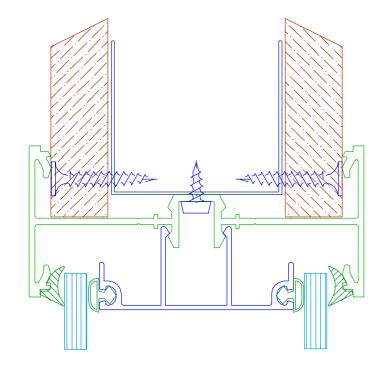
D SECTION THRU SGLE GLAZED MULLION
